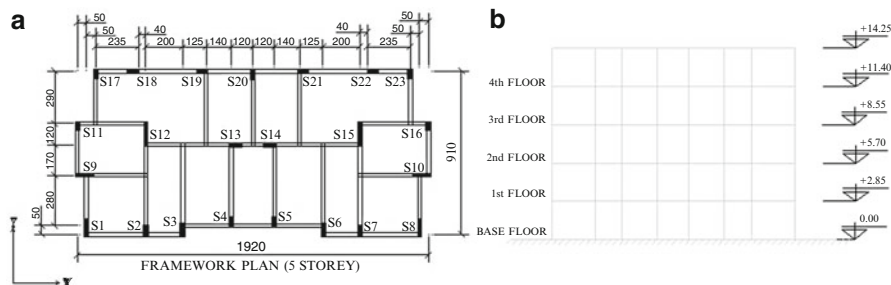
Five-storey building configuration. (a) Plan view (cm) and (b) lateral view (m)
